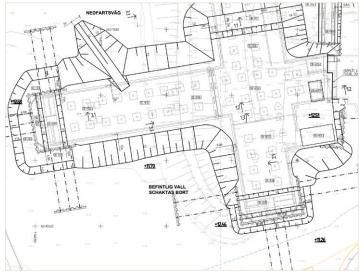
Plan view of building 16. AU 18 in L=18 meter on the perimeter of the building. Behind the main sheet pile wall, a short stretch of AU sheet piles in shorter lengths constitutes the anchor wall.
